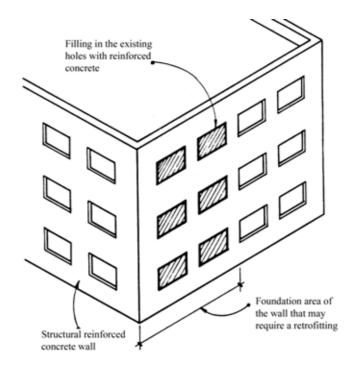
Transformation of structural reinforced concrete wall by filling the empty spaces such as windows; interventions on masonry structures
